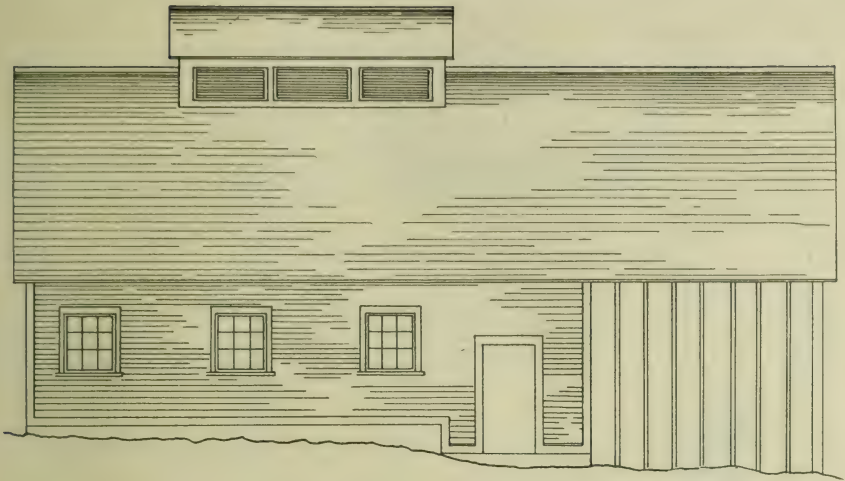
SIDE ELEVATION OF SUGAR HOUSE
